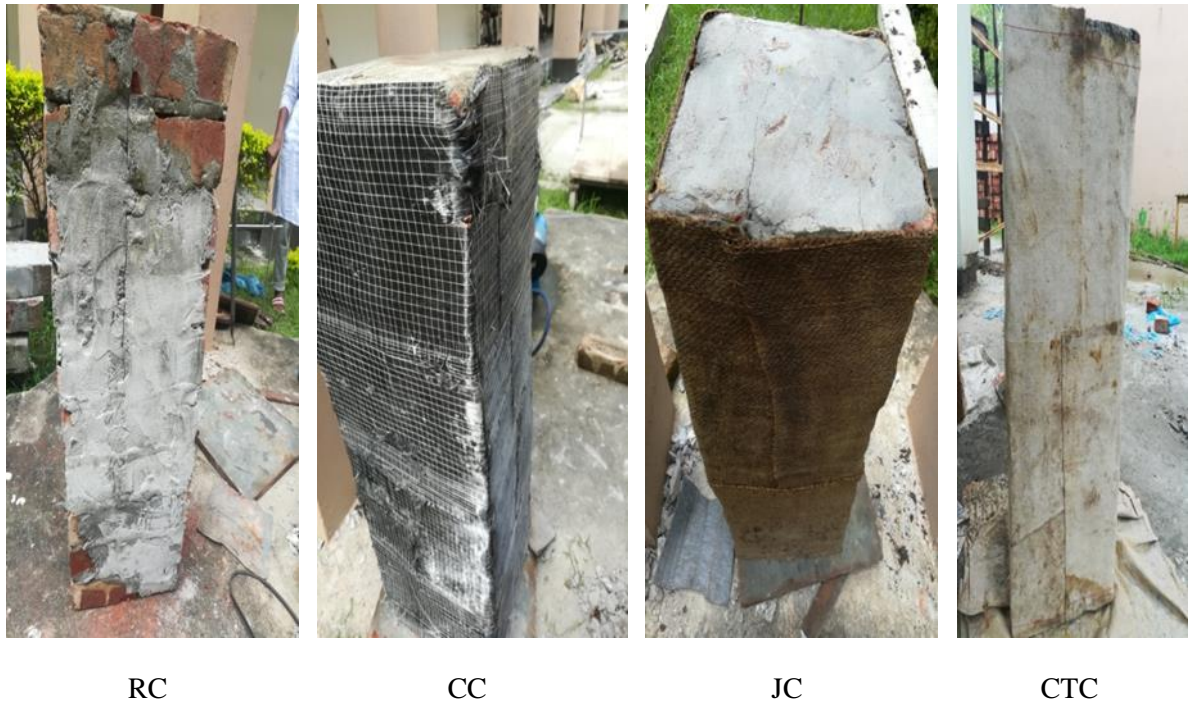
Failure Pattern of unwrapped Brick Masonry Column (RC), CFRP wrapped column (CC), Jute fiber wrapped column (JC) and Cotton fiber wrapped column (CTC)
